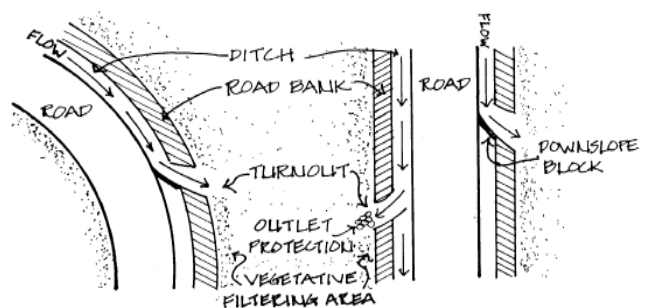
Illustrations showing road turnouts from ditches (MA Unpaved Roads BMP Manual) and directly from road surface (Alabama Forest Service).
